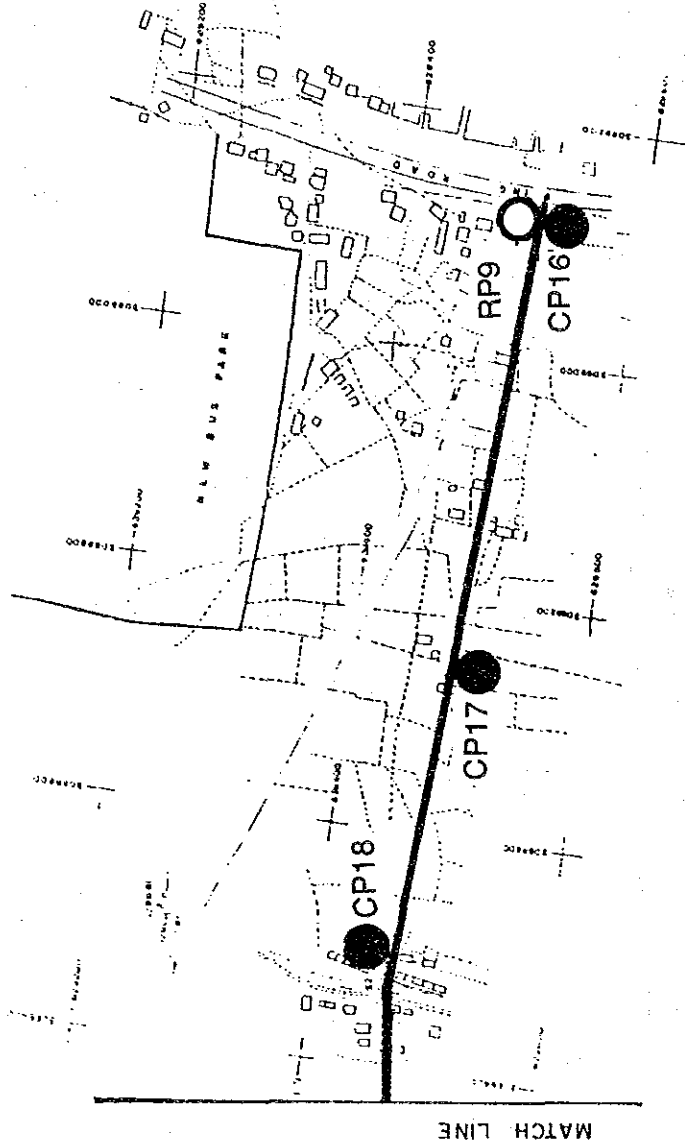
LOCATION OF ROAD PITS (7/8)
